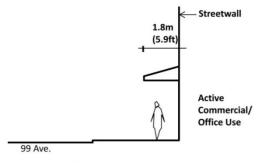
Core Commercial District – Downtown Ground Floor Frontage
